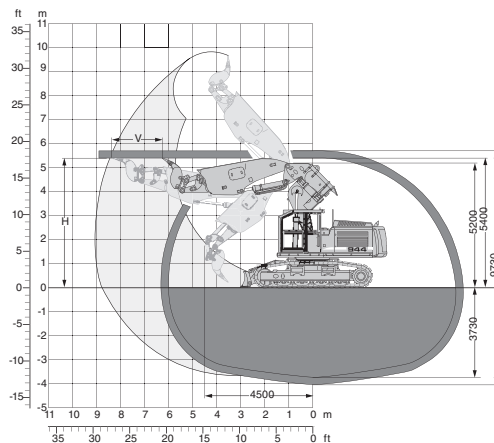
Example of an excavator working on a tunnel face and its operational area. (Courtesy of Liebherr.)
